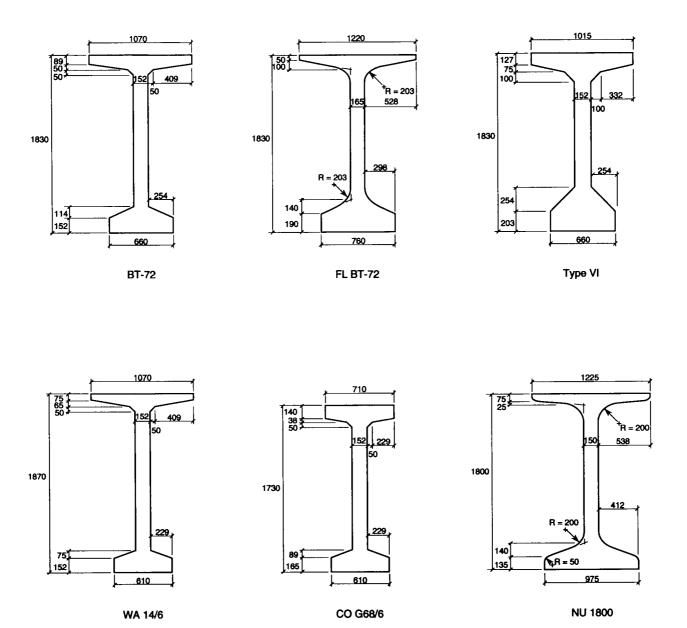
Cross sections of girders analyzed (dimensions in millimeters).
